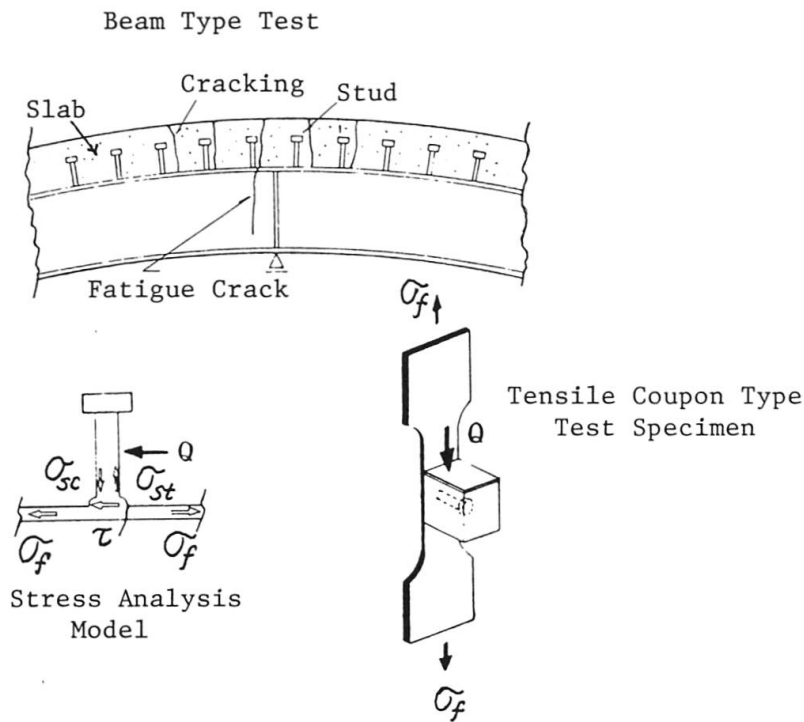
Fatigue Test of Flange Plate in Tension with Welded Studs
